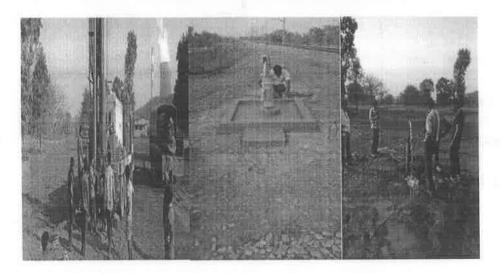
Drilling of bore well & Installation of Submersible pump & Hand pump at Labour colony, Badadarha
